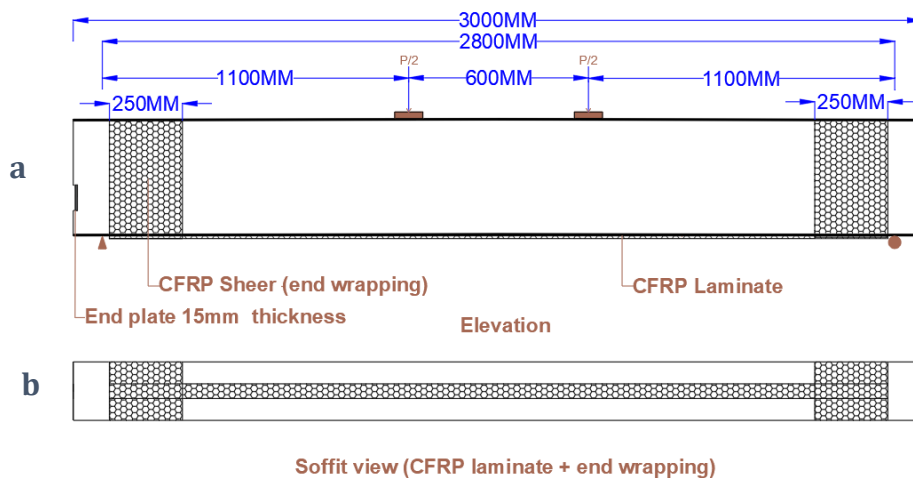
Laminate and end sheet anchorage, a- elevation b- soffit view
